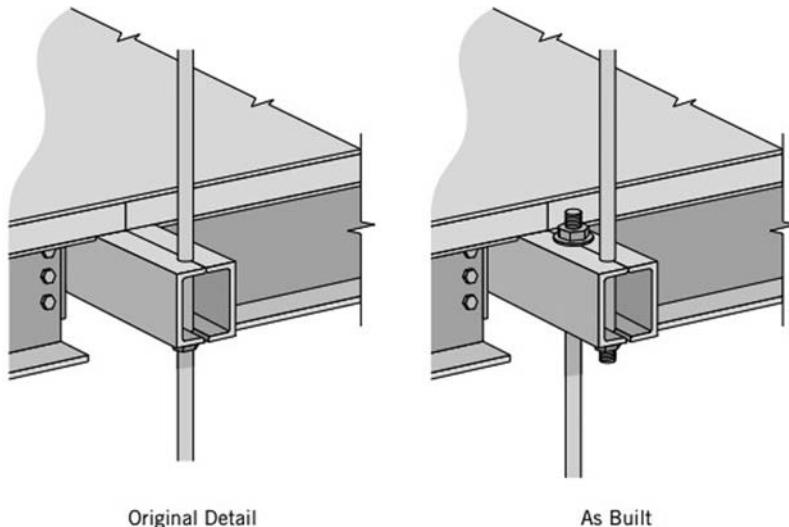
The walkway suspension connection in Hyatt Regency Hotel in Kansas City, as originally designed and as built. The change made during construction left the second-floor walkway hanging from the fourth-floor walkway, rather than from the roof truss.
